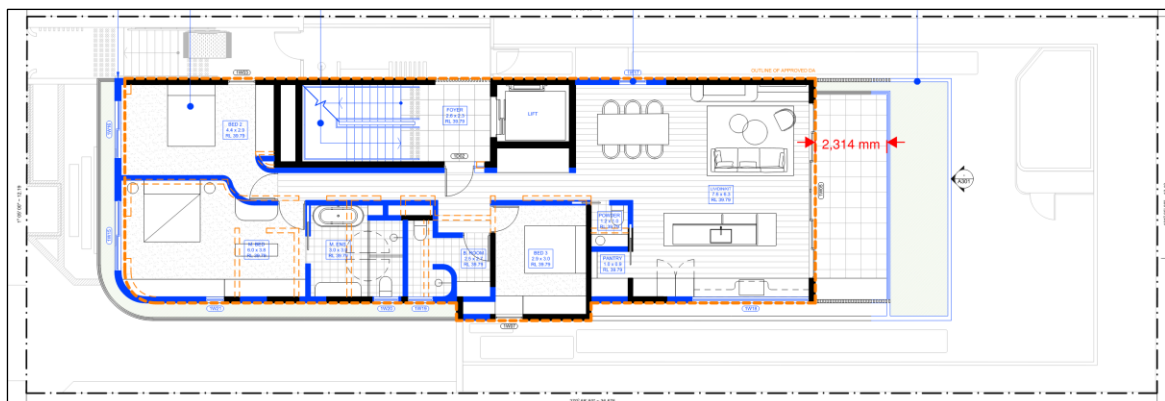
Proposed first floor plan (source: Common Office, dated 5/11/2025)
